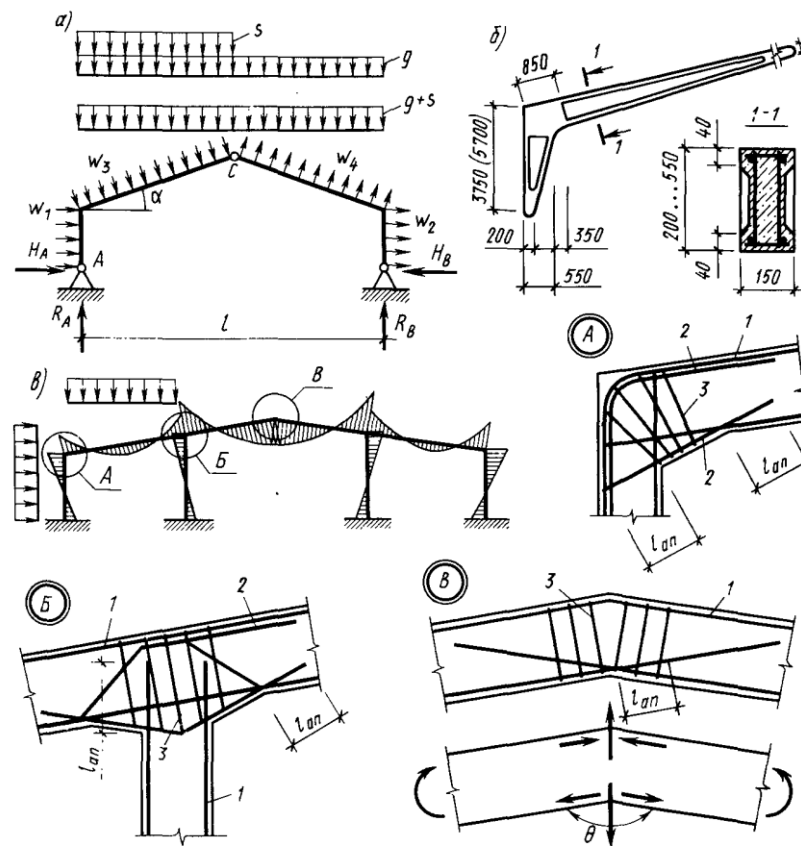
Calculation scheme of three-hinged frame (a), prefabricated half-frame (b), bending moment diagram (c) and reinforcement of cast frame nodes: 1-welded reinforcement joints; 2 additional longitudinal armature rods; 3 additional clamps
